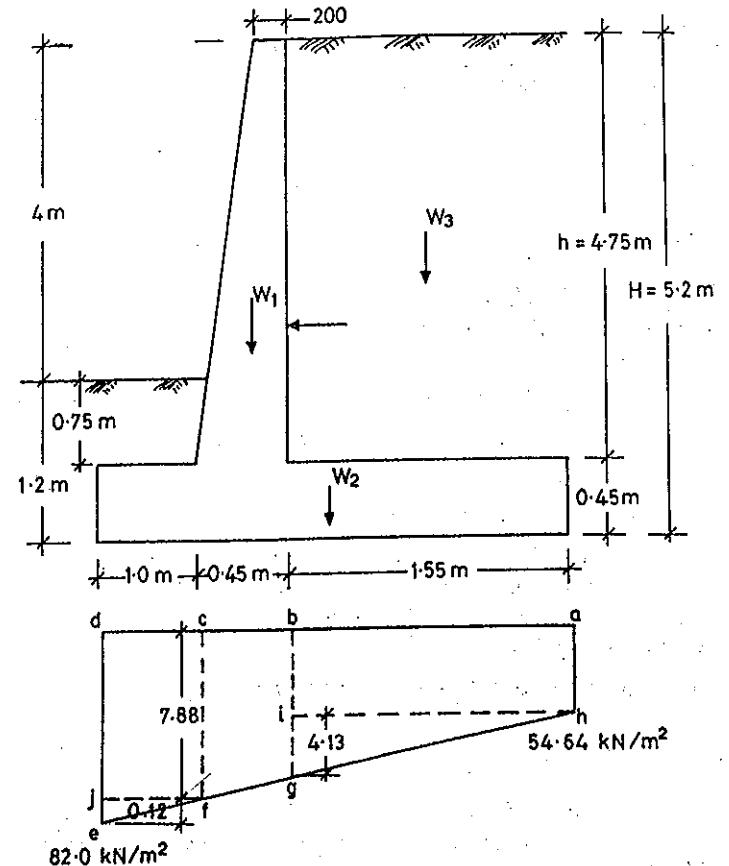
Forces Acting on Cantilever Retaining Wall
